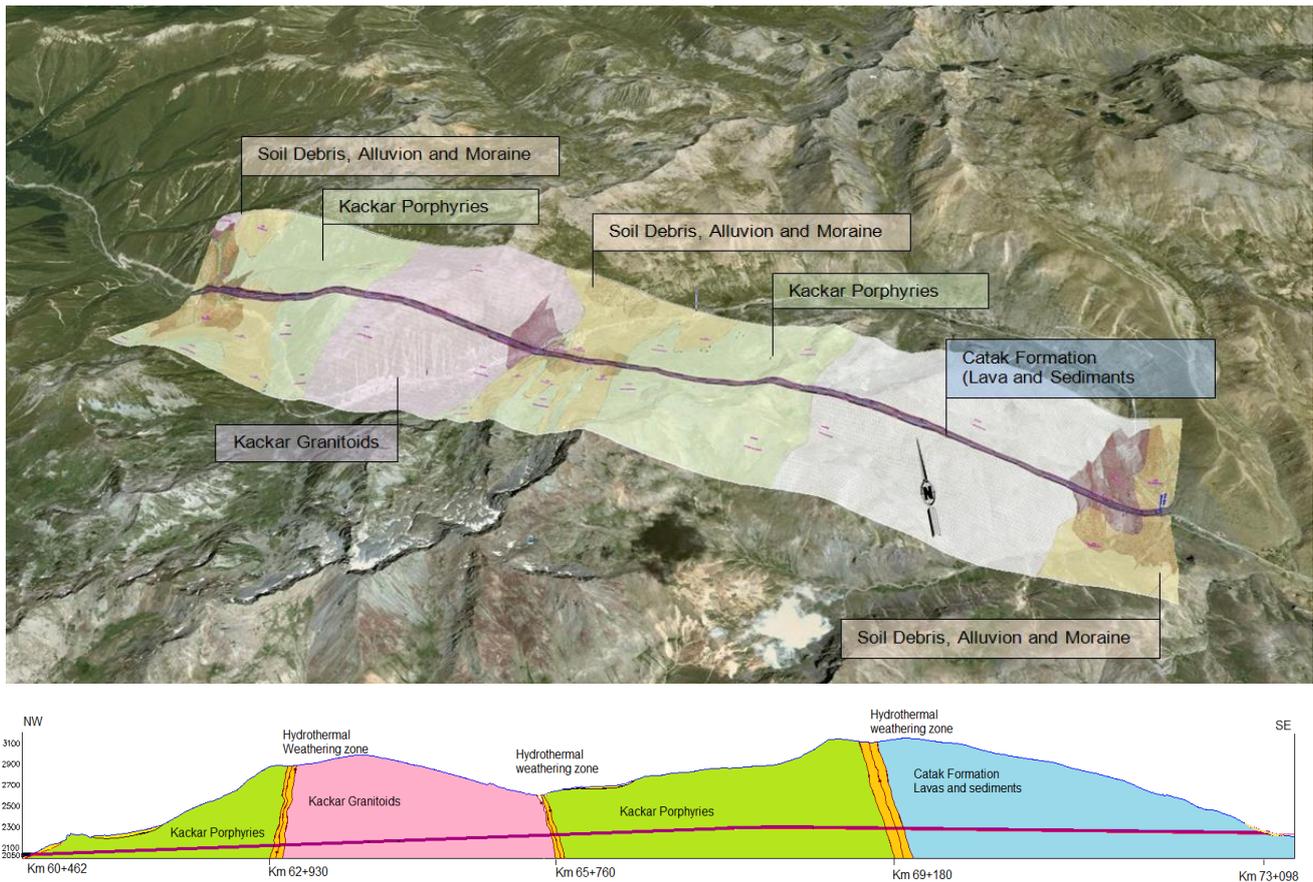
Geological plan and longitudinal section of the Ovit tunnel
